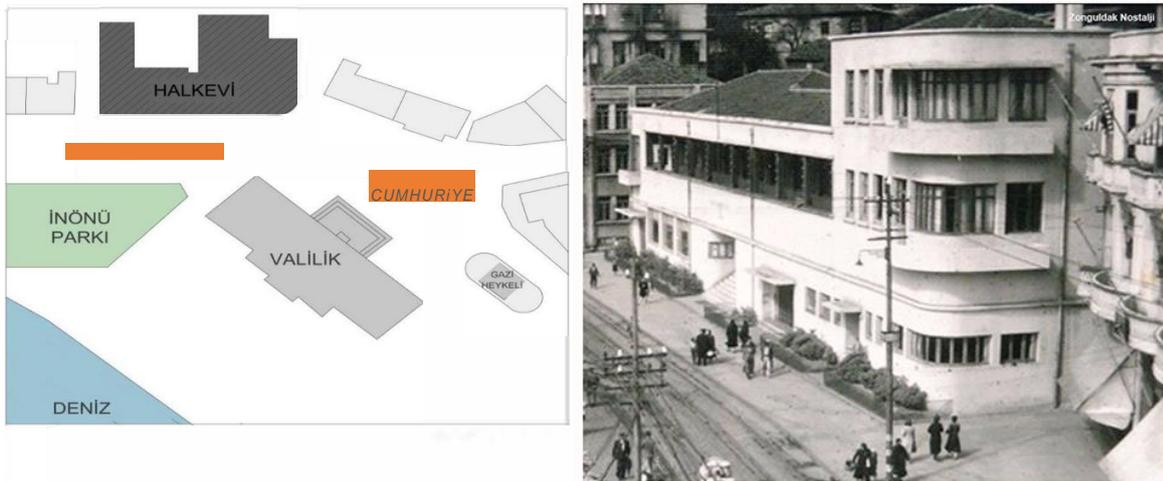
Zonguldak People House site plan and the building in 1940's (Anonym, 2016)
